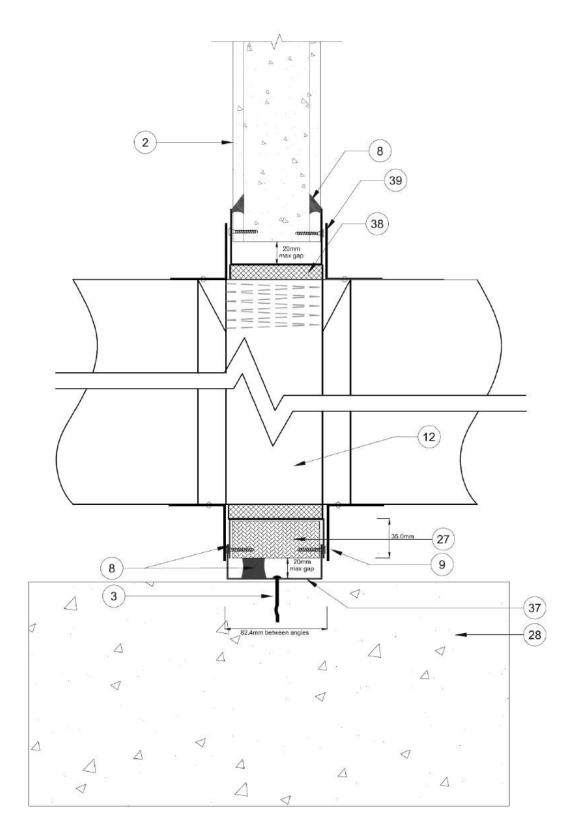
Holyoake IBD-FS and IBD Damper installation 35mm-55mm from base of wall
